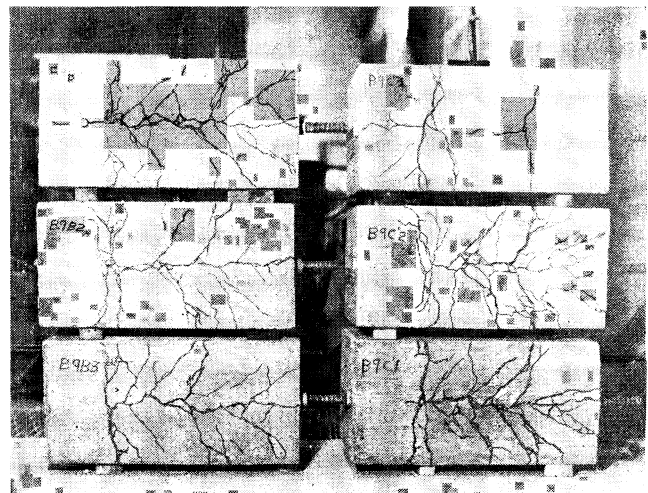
Post-test photograph of bottoms of typical # 9 specimens showing splitting failure
